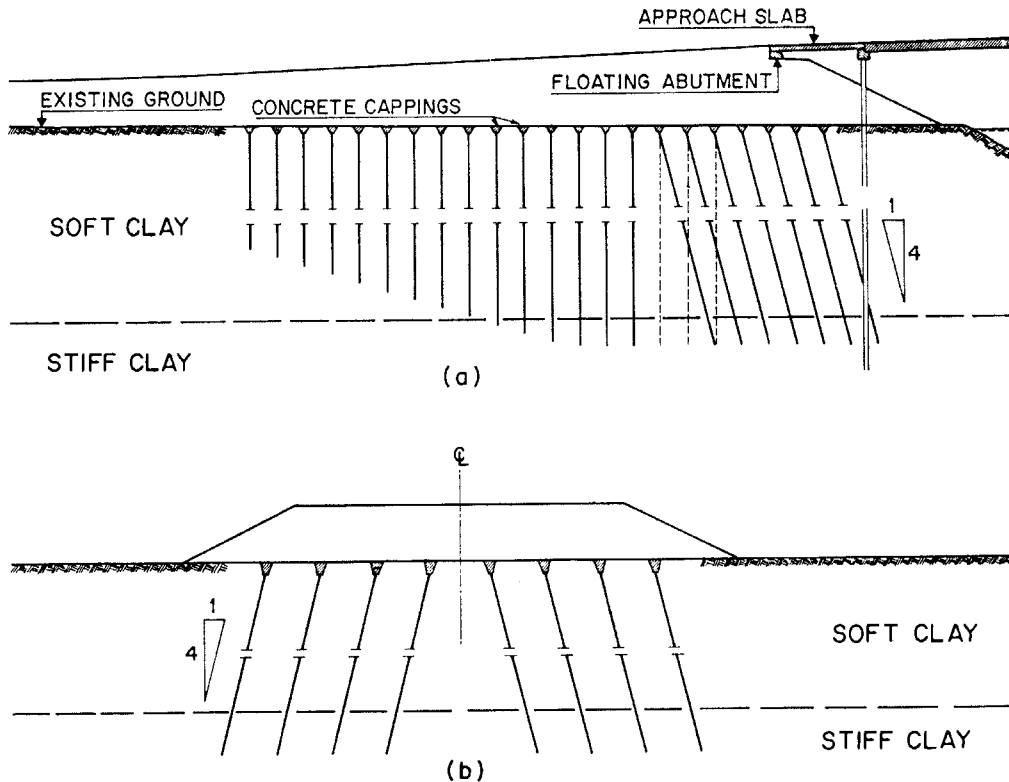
Typical layout of embankment piles; (a) longitudinal profile, (b) cross-section.
